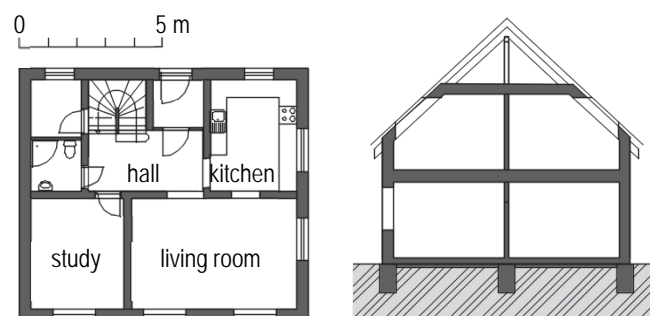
The studied single-family house. Left - first floor plan. Right - cross section.
